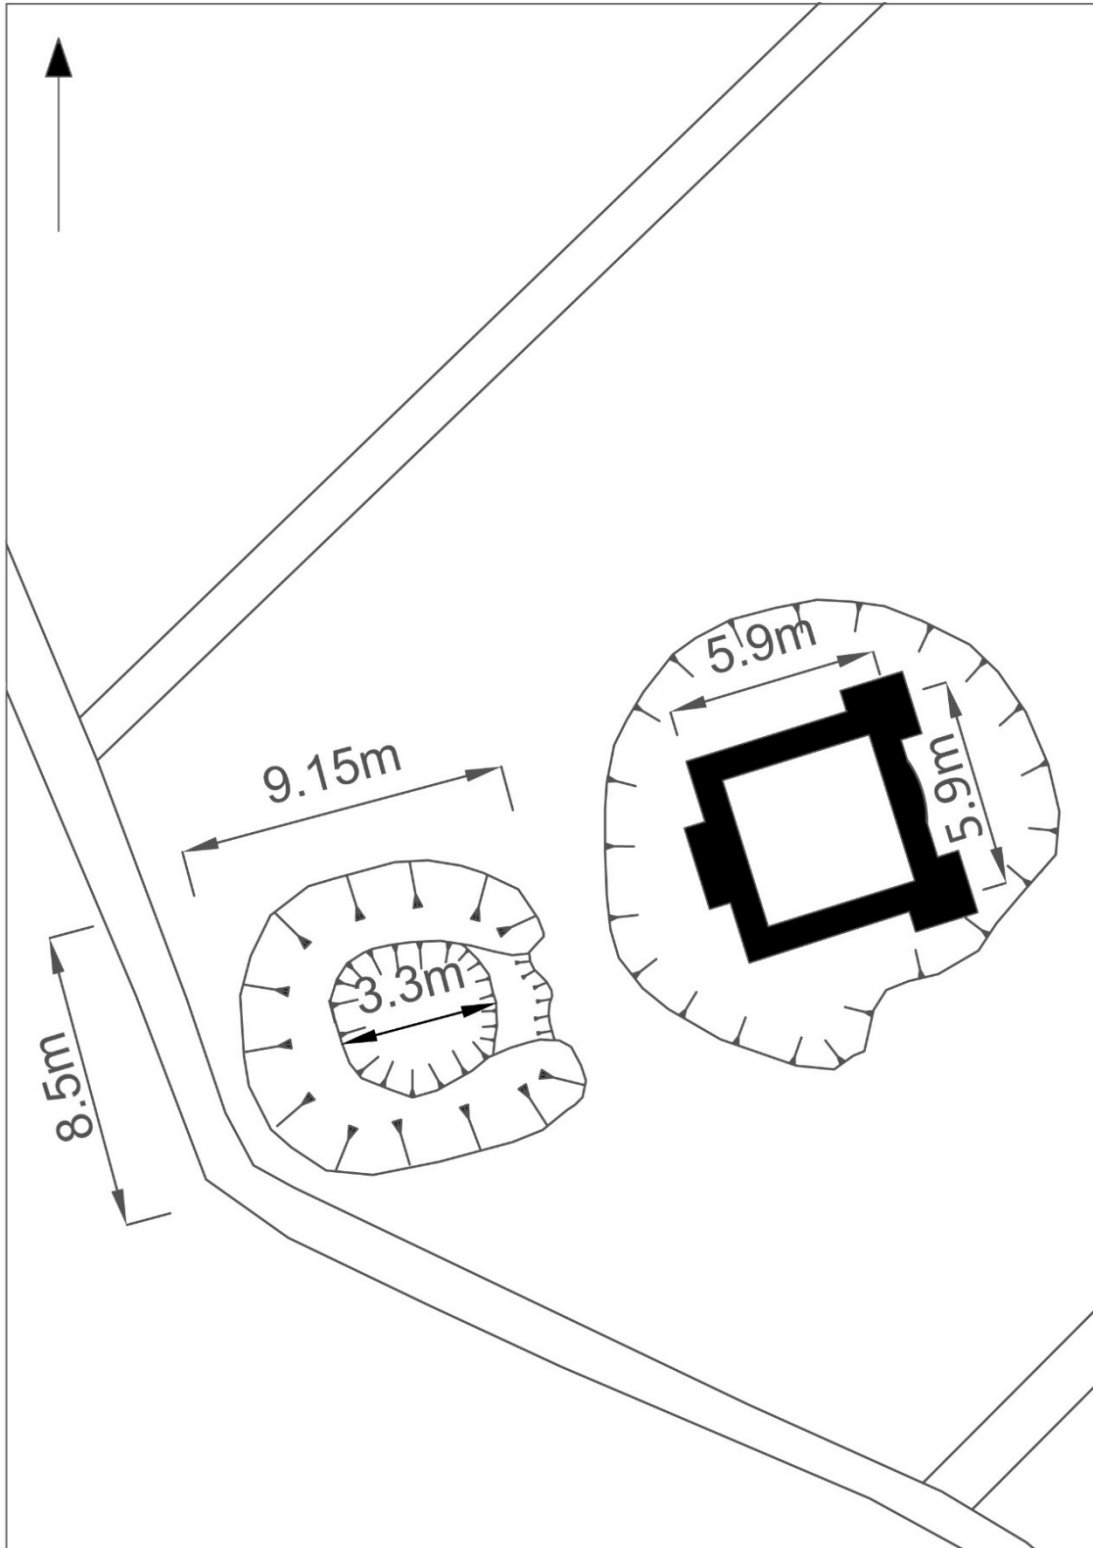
Detailed plan of the signal tower and adjacent hut foundation at Malin Beg Signal Station.
